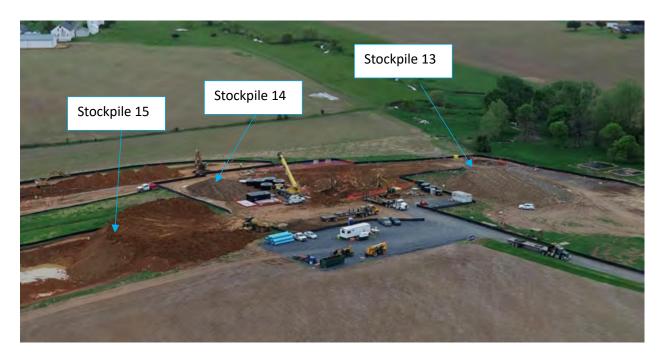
Sewer Pump Station Excavation – 05/04/2023
